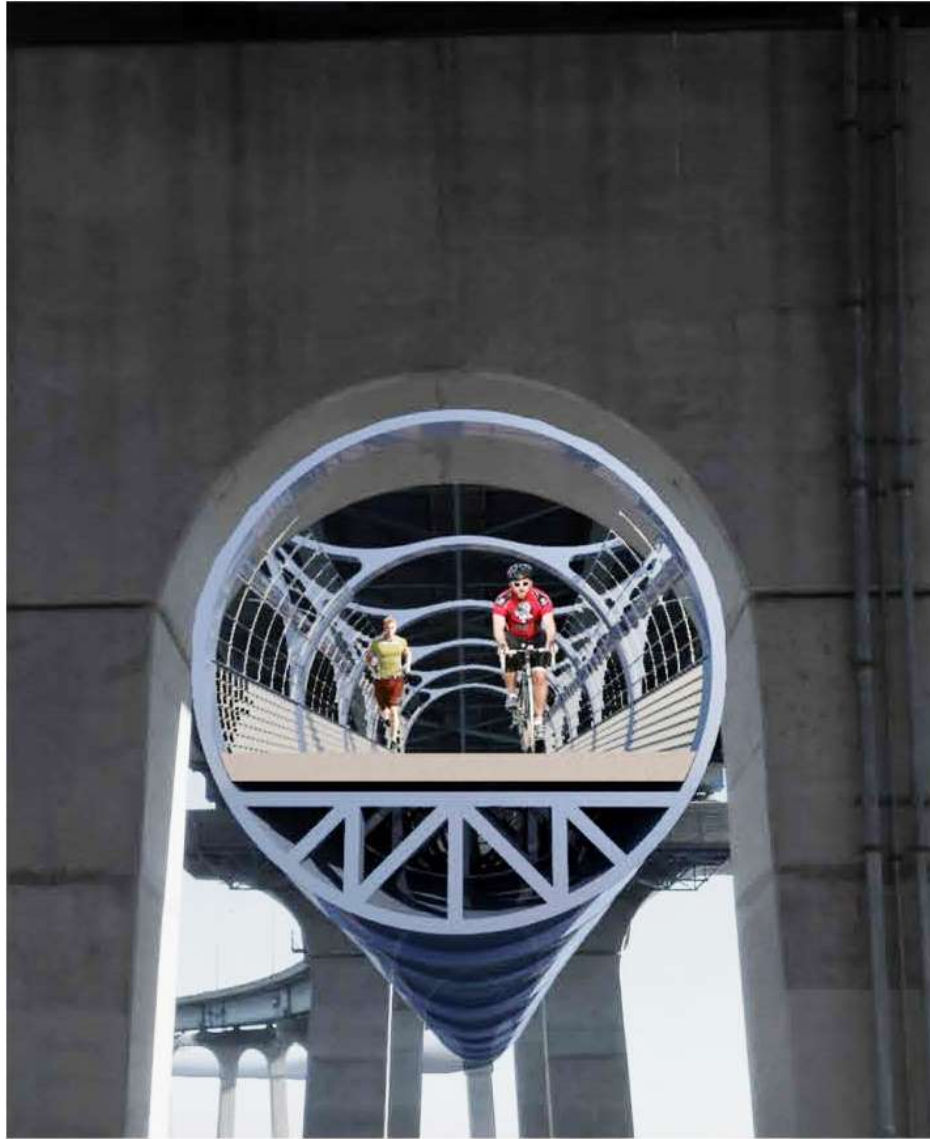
Initial Conceptual Bicycle/Pedestrian Facility Structure Cross-Section (courtesy of domusstudio architecture)
